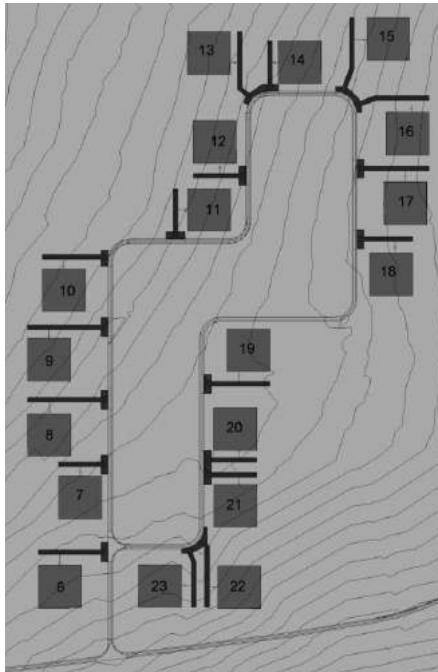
Suggested Site Specific Driveway Access to Court Sites Shown Red
